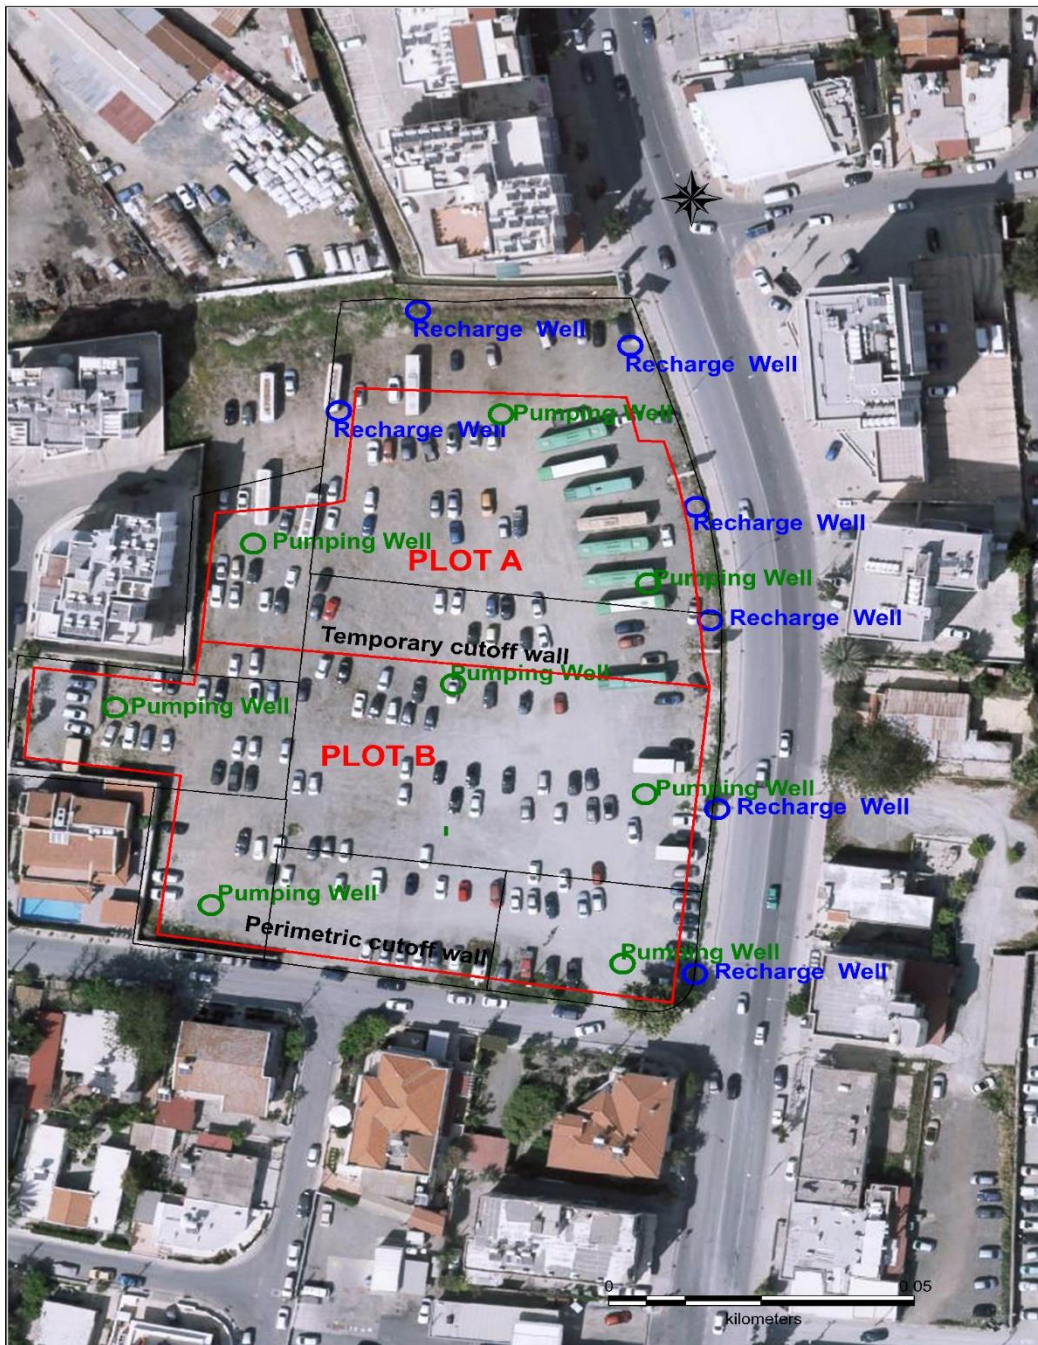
Proposed arrangement of drainage (pumping wells) and recharge holes in basement – Perimetric and Temporary Cut off Walls
